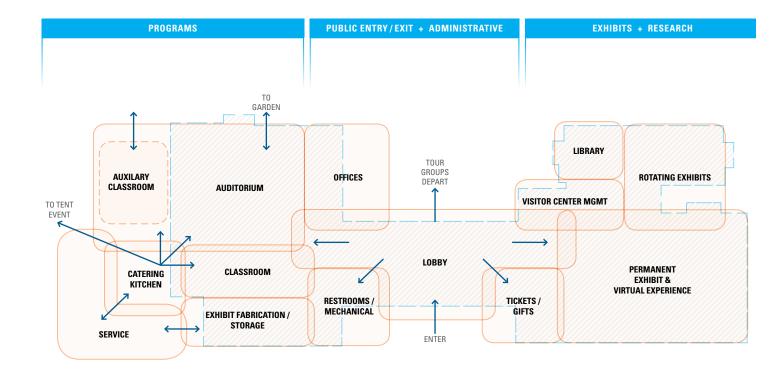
CONCEPTUAL LAYOUT OF VISITOR CENTER
